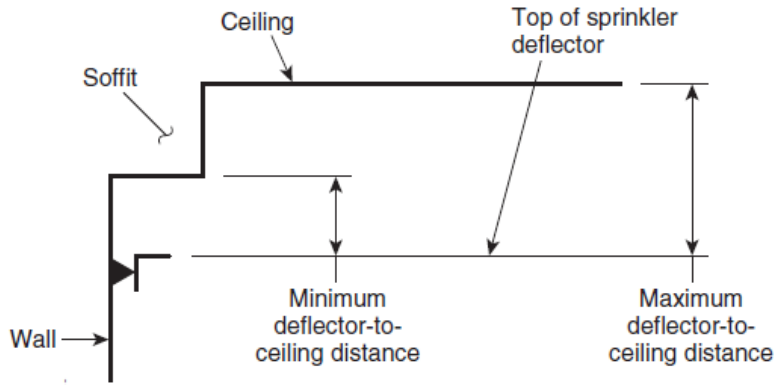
Location Sidewalls with Respect to Soffits — Sidewall Under Soffit.
